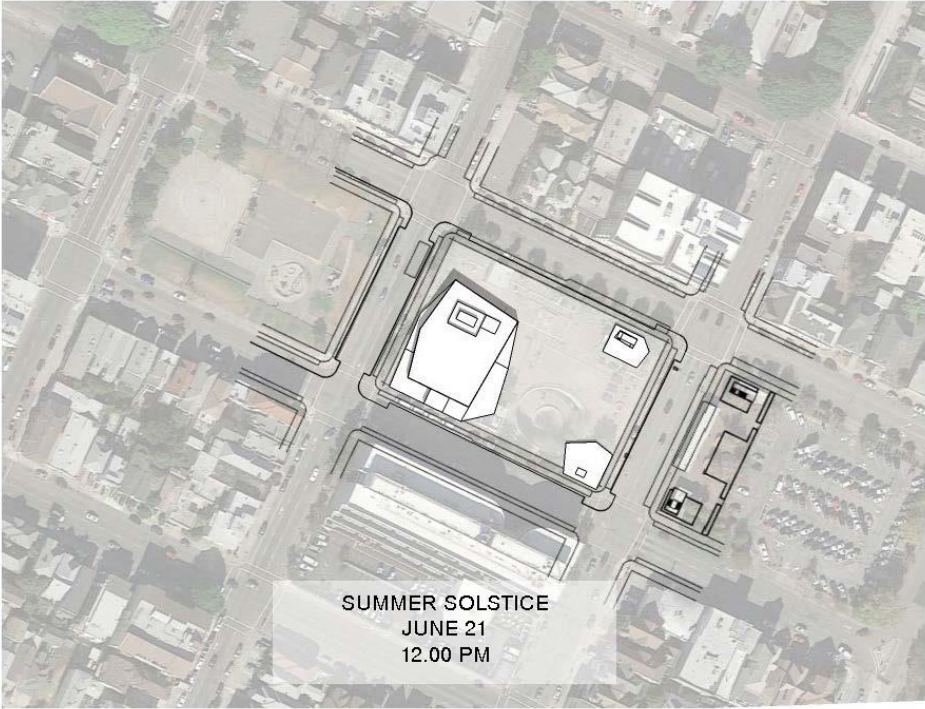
Shadows cast by the proposed TOF building on summer solstice at 12 noon.
